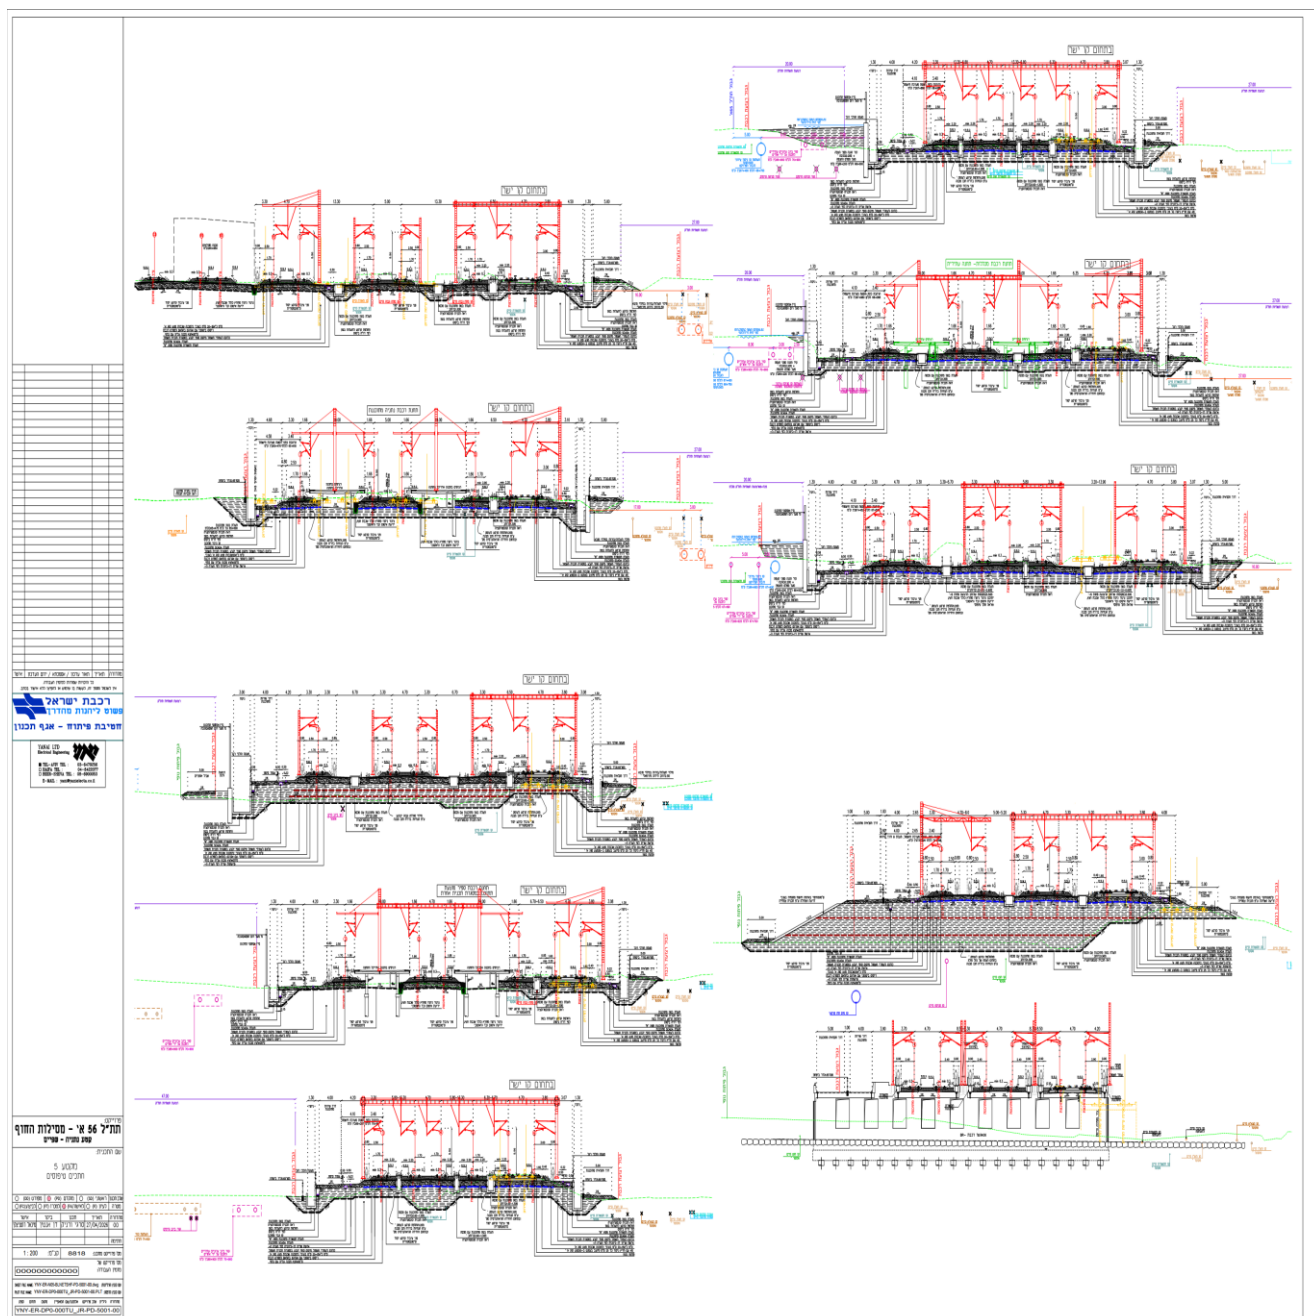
TATAL 65 TYPICAL CROSS SECTIONS (Section 5)
